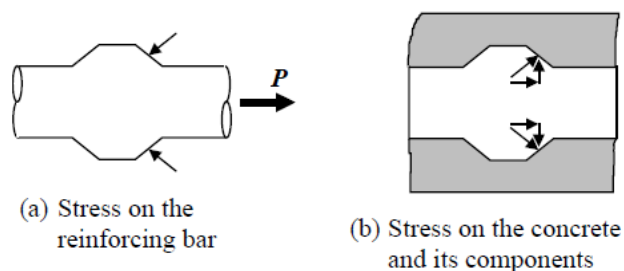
Bond and splitting stresses between a deformed bar and the surrounding concrete (Lundgren, 1999)
